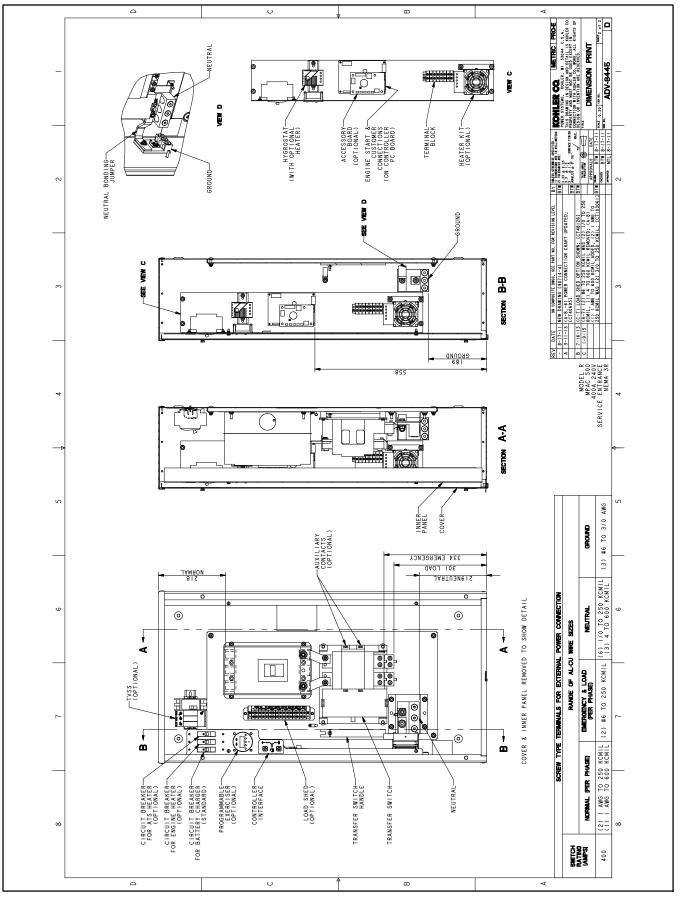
Dimension Drawing, 400 Amp Service Entrance Model, ADV-8445, Sheet 2 of 2
